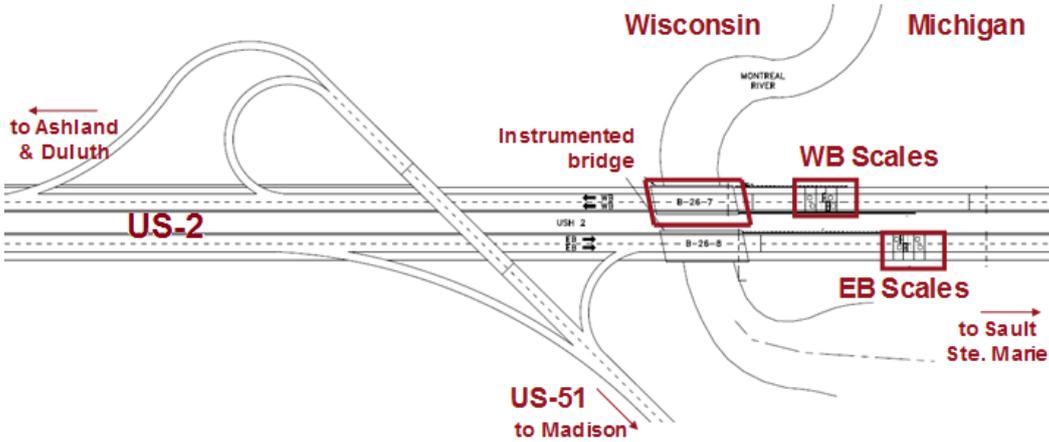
Plan of US Highway 2 at Wisconsin-Michigan border, showing location of in-pavement WIM and instrumented bridge.
